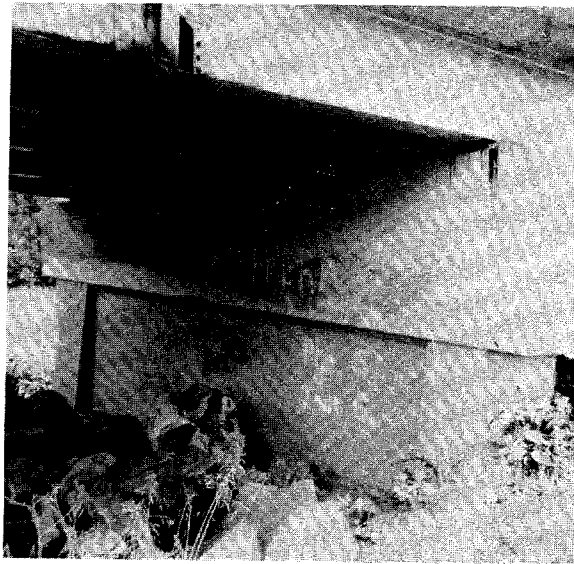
Footing of pier on US-70 bridge over Saline River near Dierks, Arkansas, following flood of May 13, 1968. (From Arkansas Dept. of Highways.)
